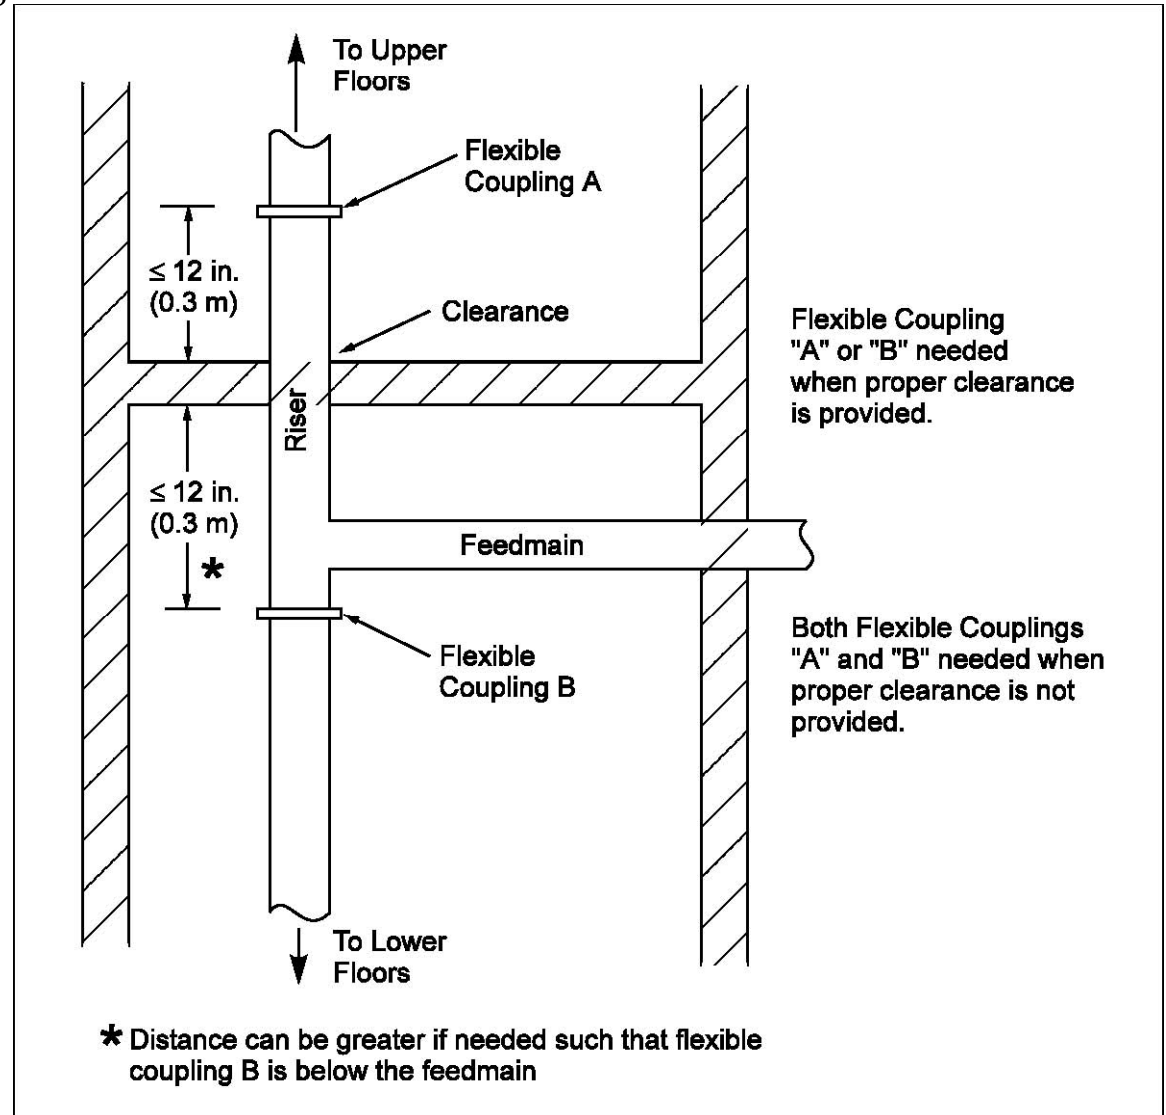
Arrangement of flexible couplings for risers passing through floors of multistory buildings
